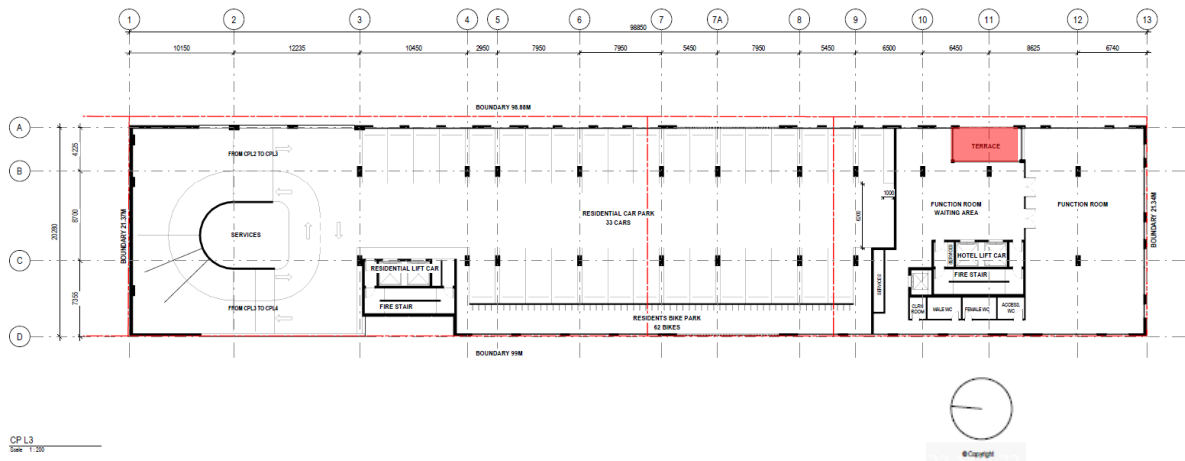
Schematic plan view of proposed development with recommended wind criteria overlaid on Level 3
